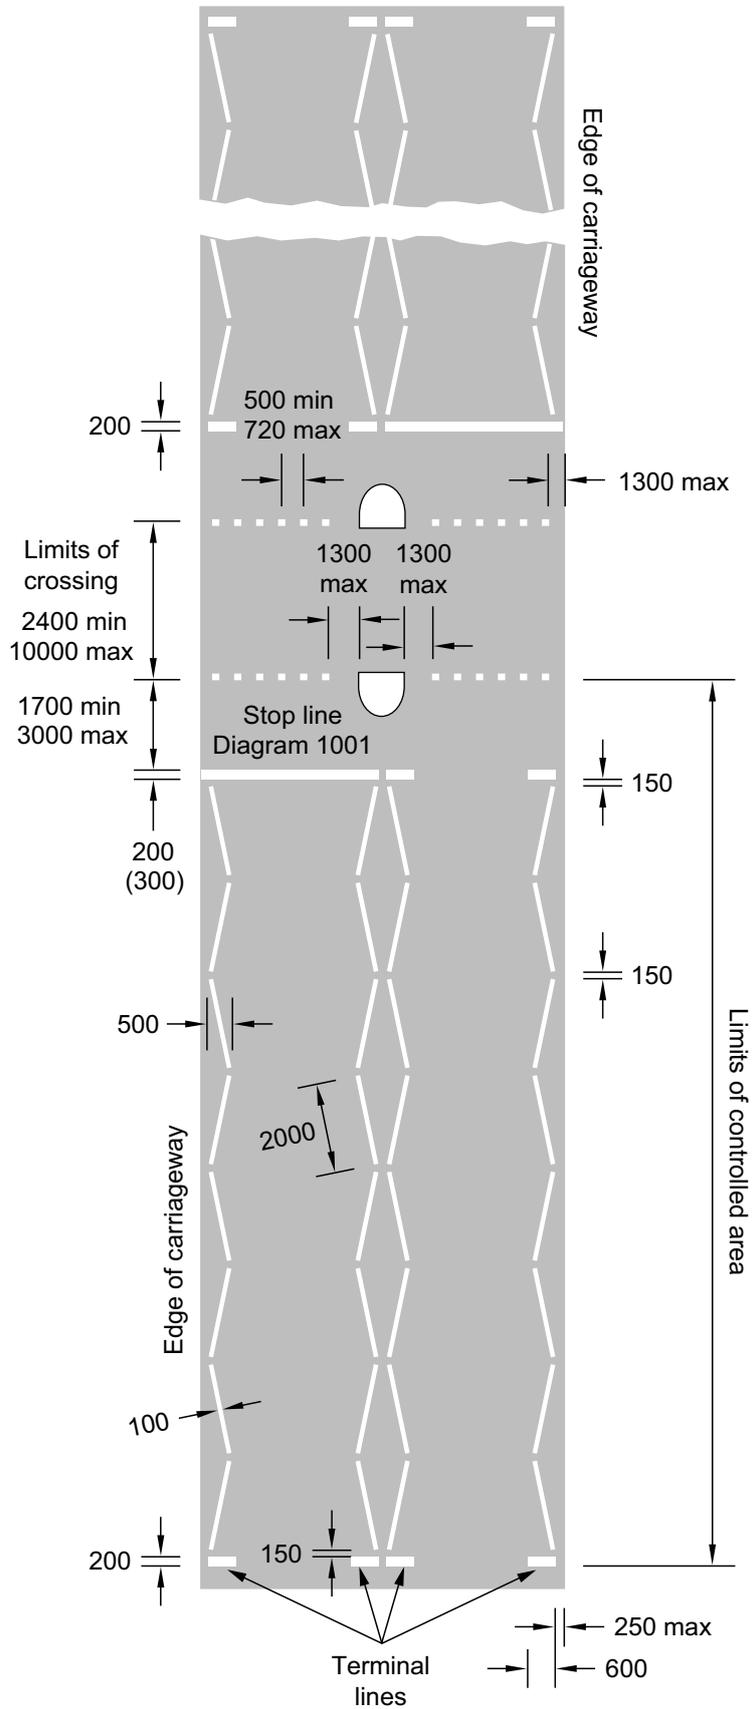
Zig-zag layout for a crossing on a two-way street with a central refuge island
